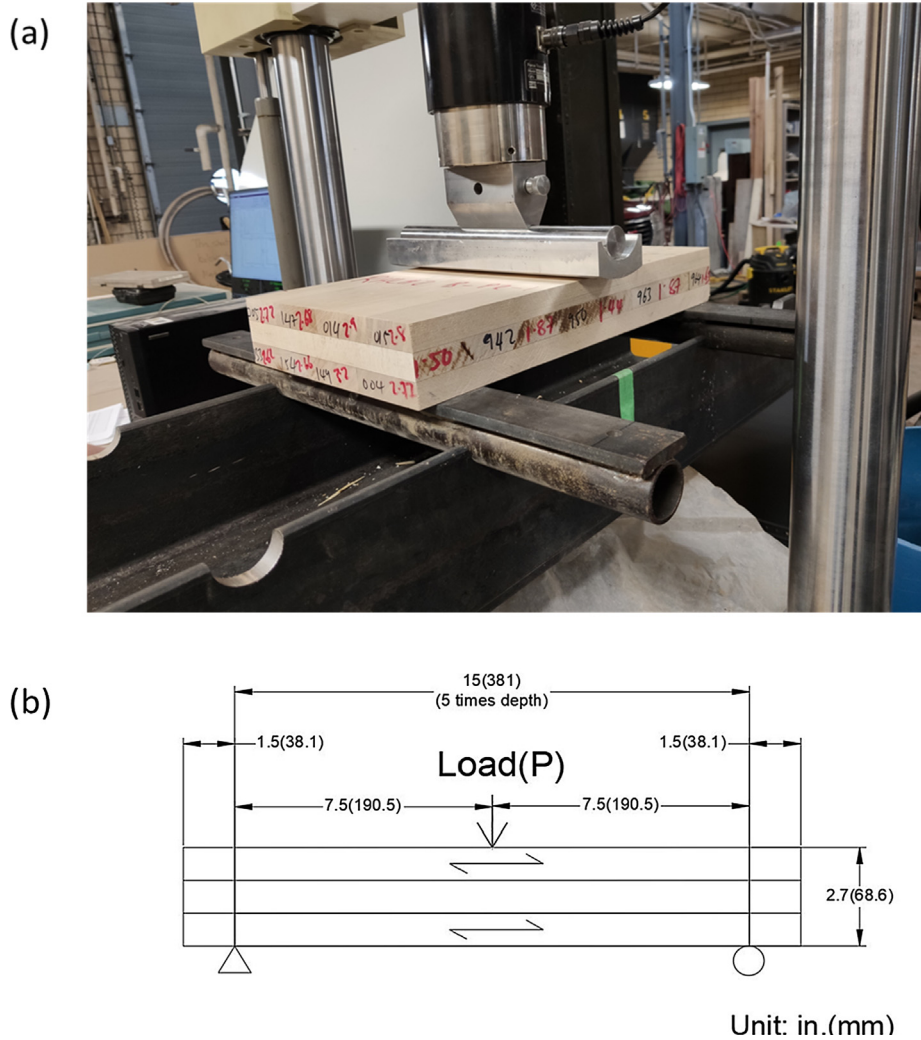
Short span bending test setup. (a) loading frame and fixtures; (b) dimension of the short span samples.
